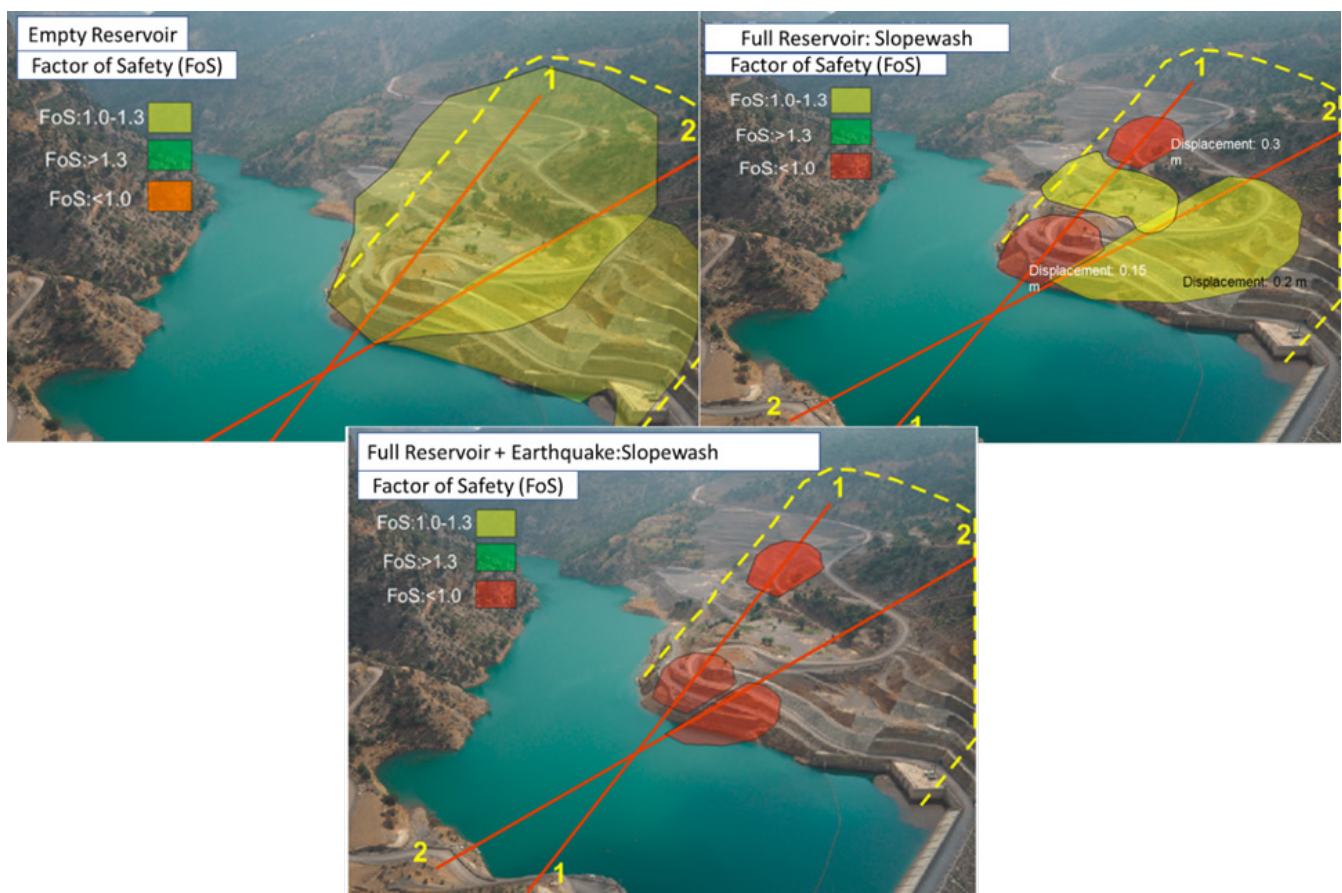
Failures in slope wash under LC-2 and LC-3 loading conditions in Section 3-3.
